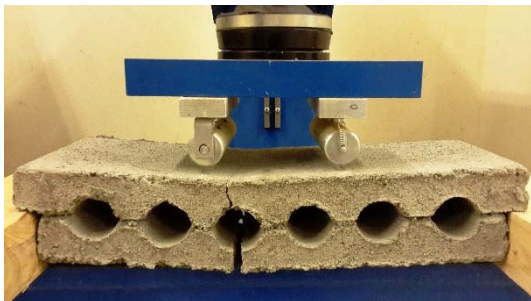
Cellular type concrete masonry rebated filler block (small)
